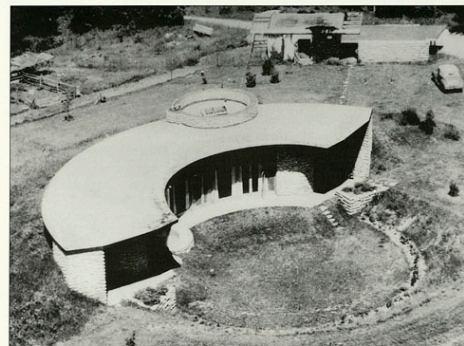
Jacobs House II, aerial view from the southwest, showing sunken garden, house and barn. Courtesy Art Institute of Chicago, Jacobs Collection.
